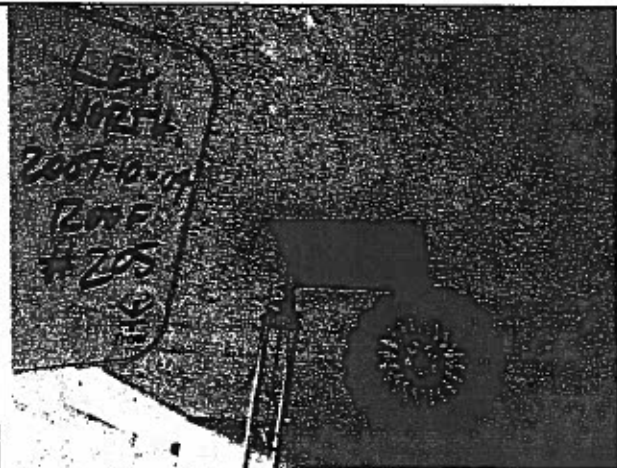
Unit #205 patio ceiling at North elevation, directly under Unit #307.
